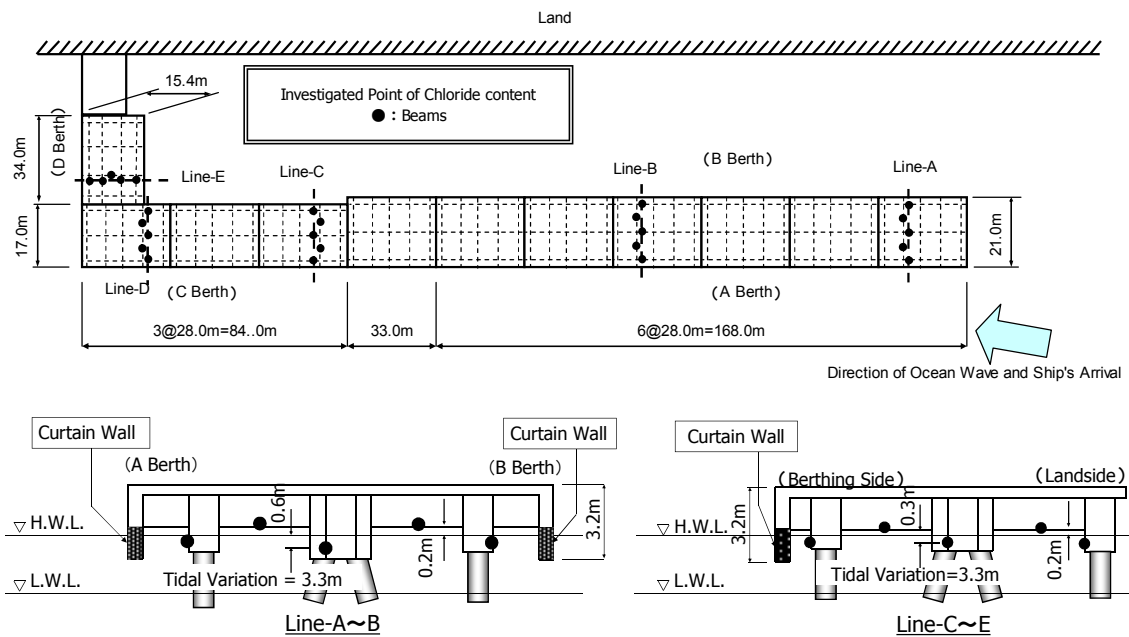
Structural Drawings of Jetty-C (OPC concrete)
